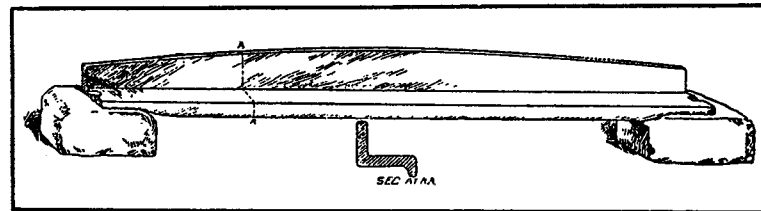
Plate rail. 3-foot long, made of cast iron, with an upward projecting flange to accommodate either cart or flanged wheels.
